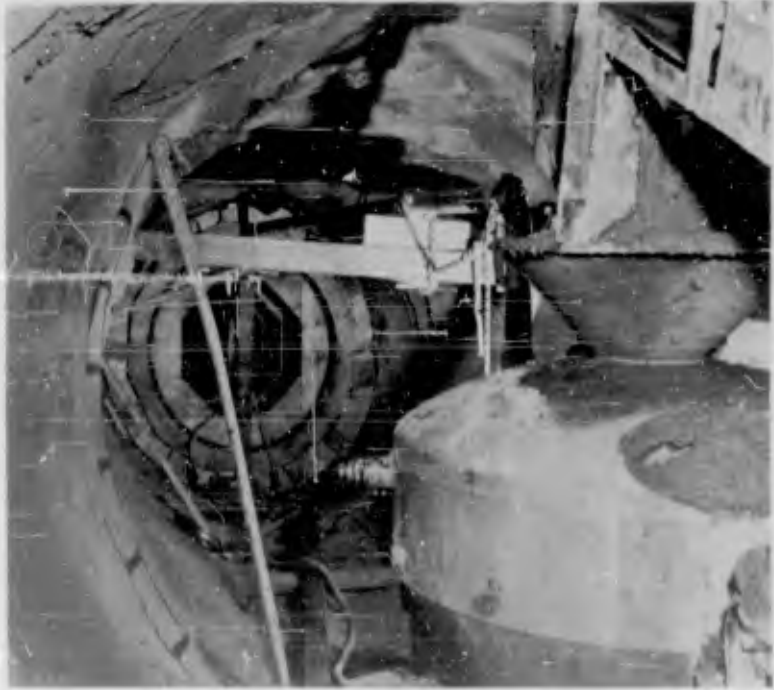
18 Equipment for pumping concrete (H&N-AEC 789-9, 1960).
